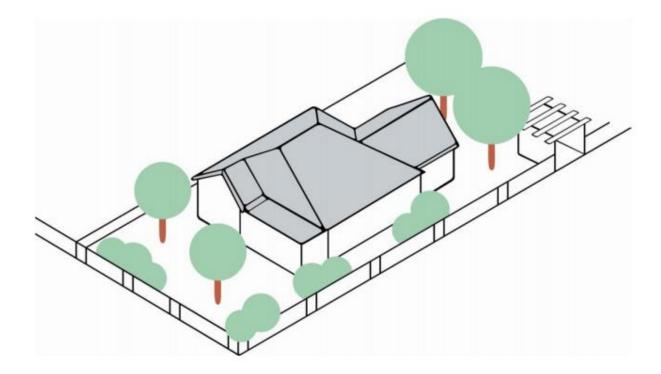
Both Street frontage elevations muse be considered on corner blocks
